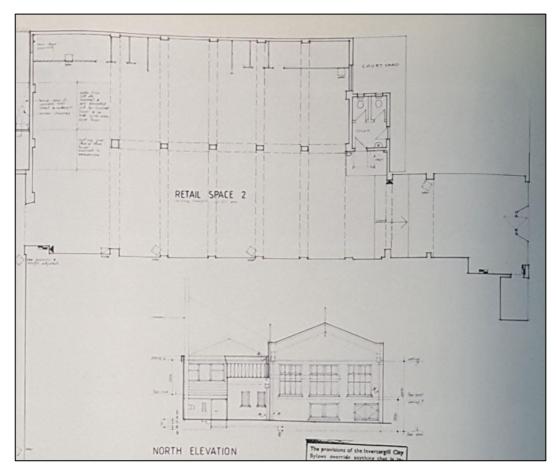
Detail from 1982 plan showing floor plan and north elevation of the Kingsland factory building (Gray, Hesselin, & Baxter, 1982).
